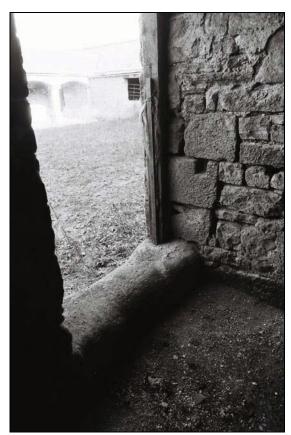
, 207: detail of the stone worn stone door thresh, from the southwest
